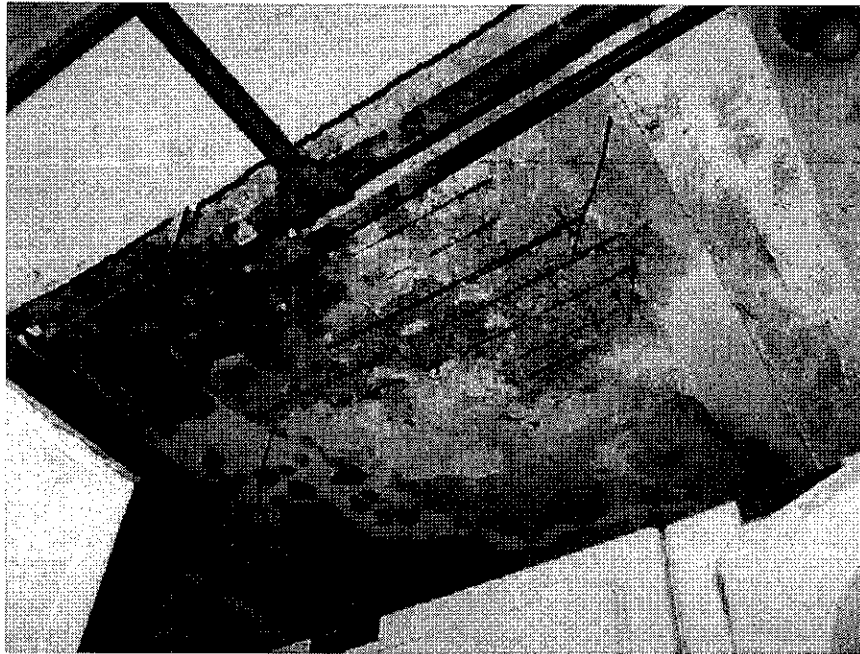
Spalled Concrete with Exposed Corroded Rebars
